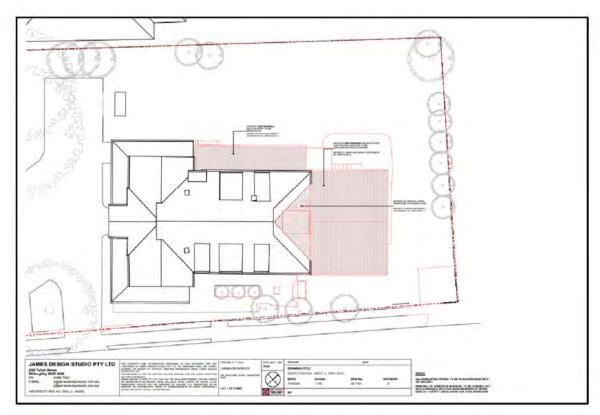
Demolition Plan - Sheet 3 - Roof Level
